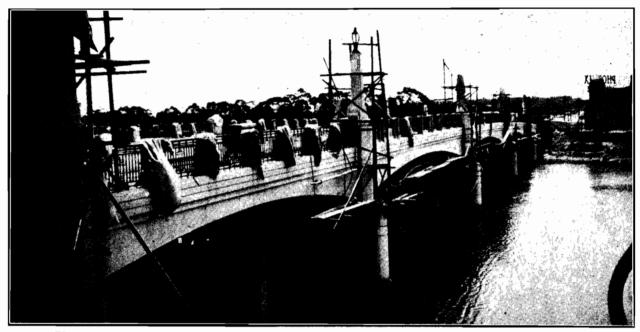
Showing new bridge in the course of erection over the River Yarra at Punt Road.
